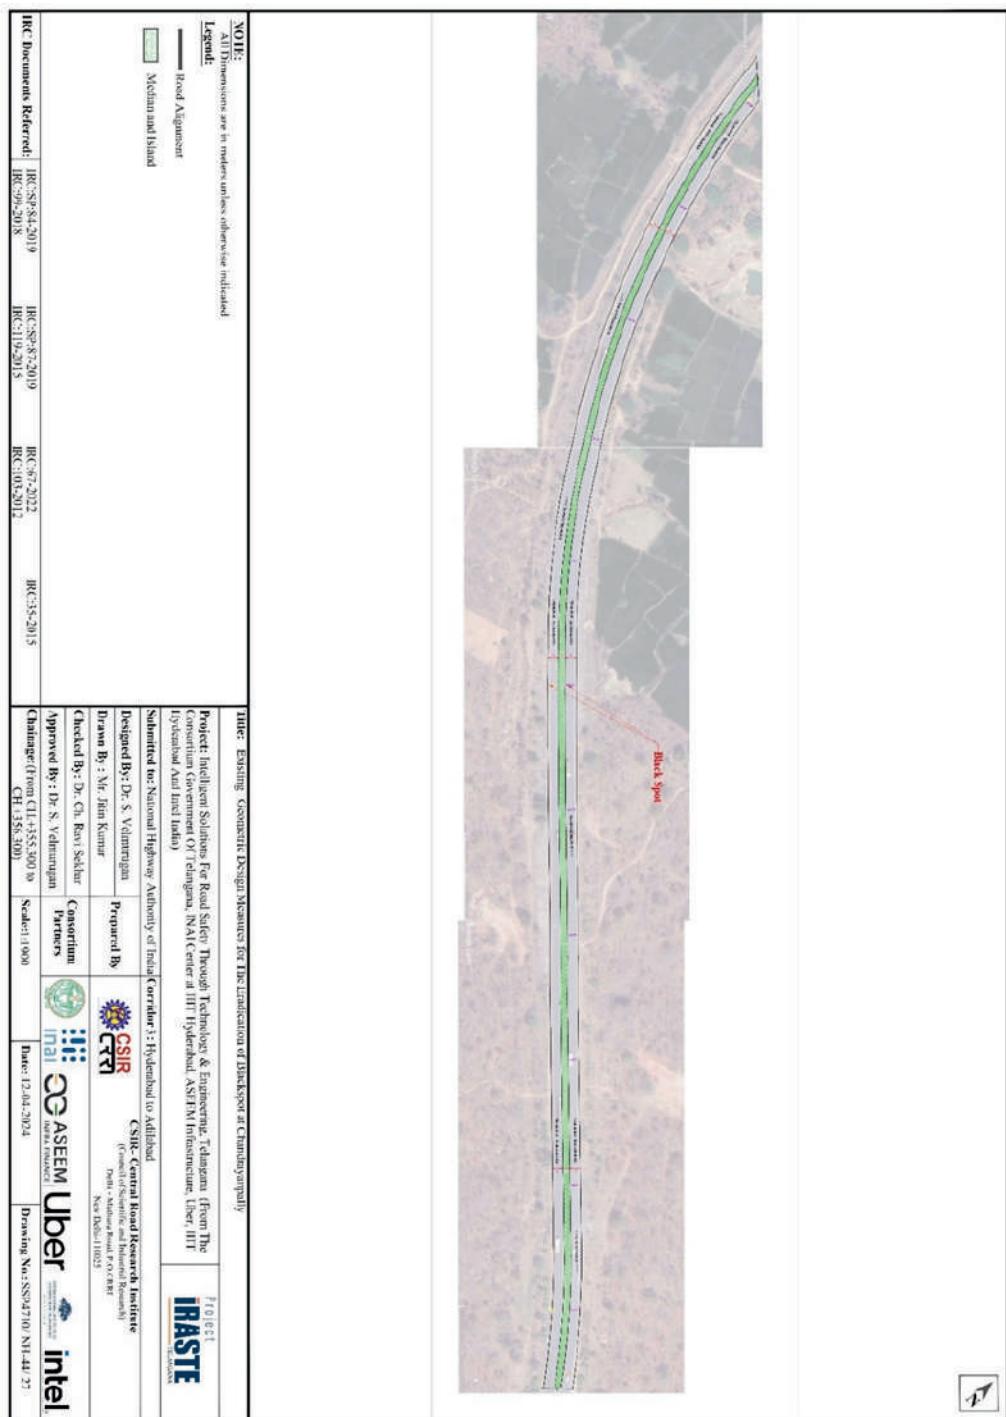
Existing Physical Survey Plan of Chandrayanpally Area on NH-44
